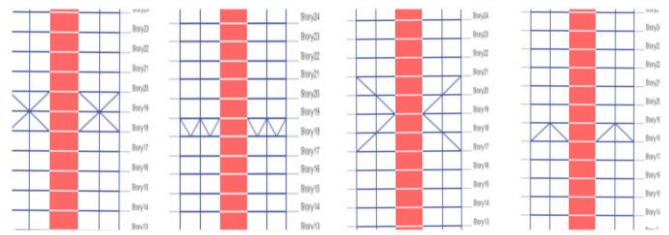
Configuration of Cross X, Chevron V, K shape and Diagonal BRB outrigger frames
